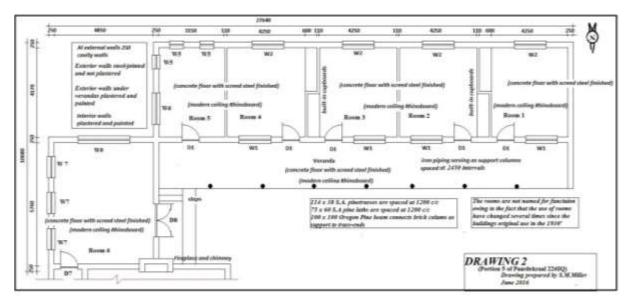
Above. Layout of rooms 1 to 6. (Drawing S.M. Miller 2016.)
